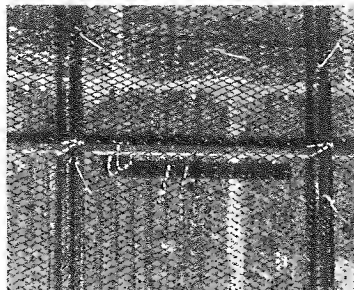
Bent Channel Iron Brace and Anchor for Horizontal Furring Stiffener.
